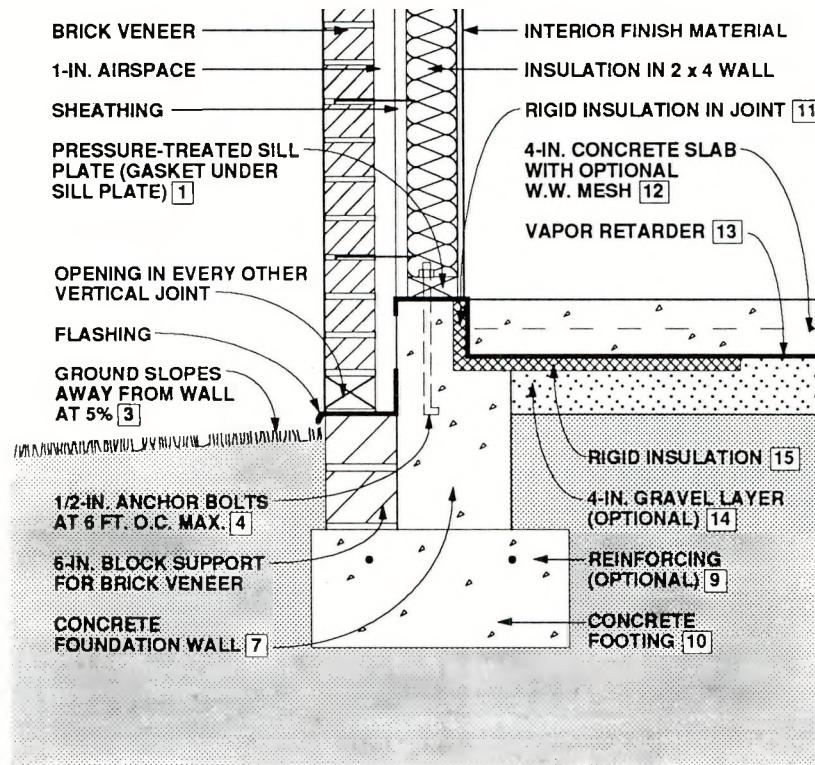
Slab-on-Grade with Brick Veneer (Insulation Under Slab)
